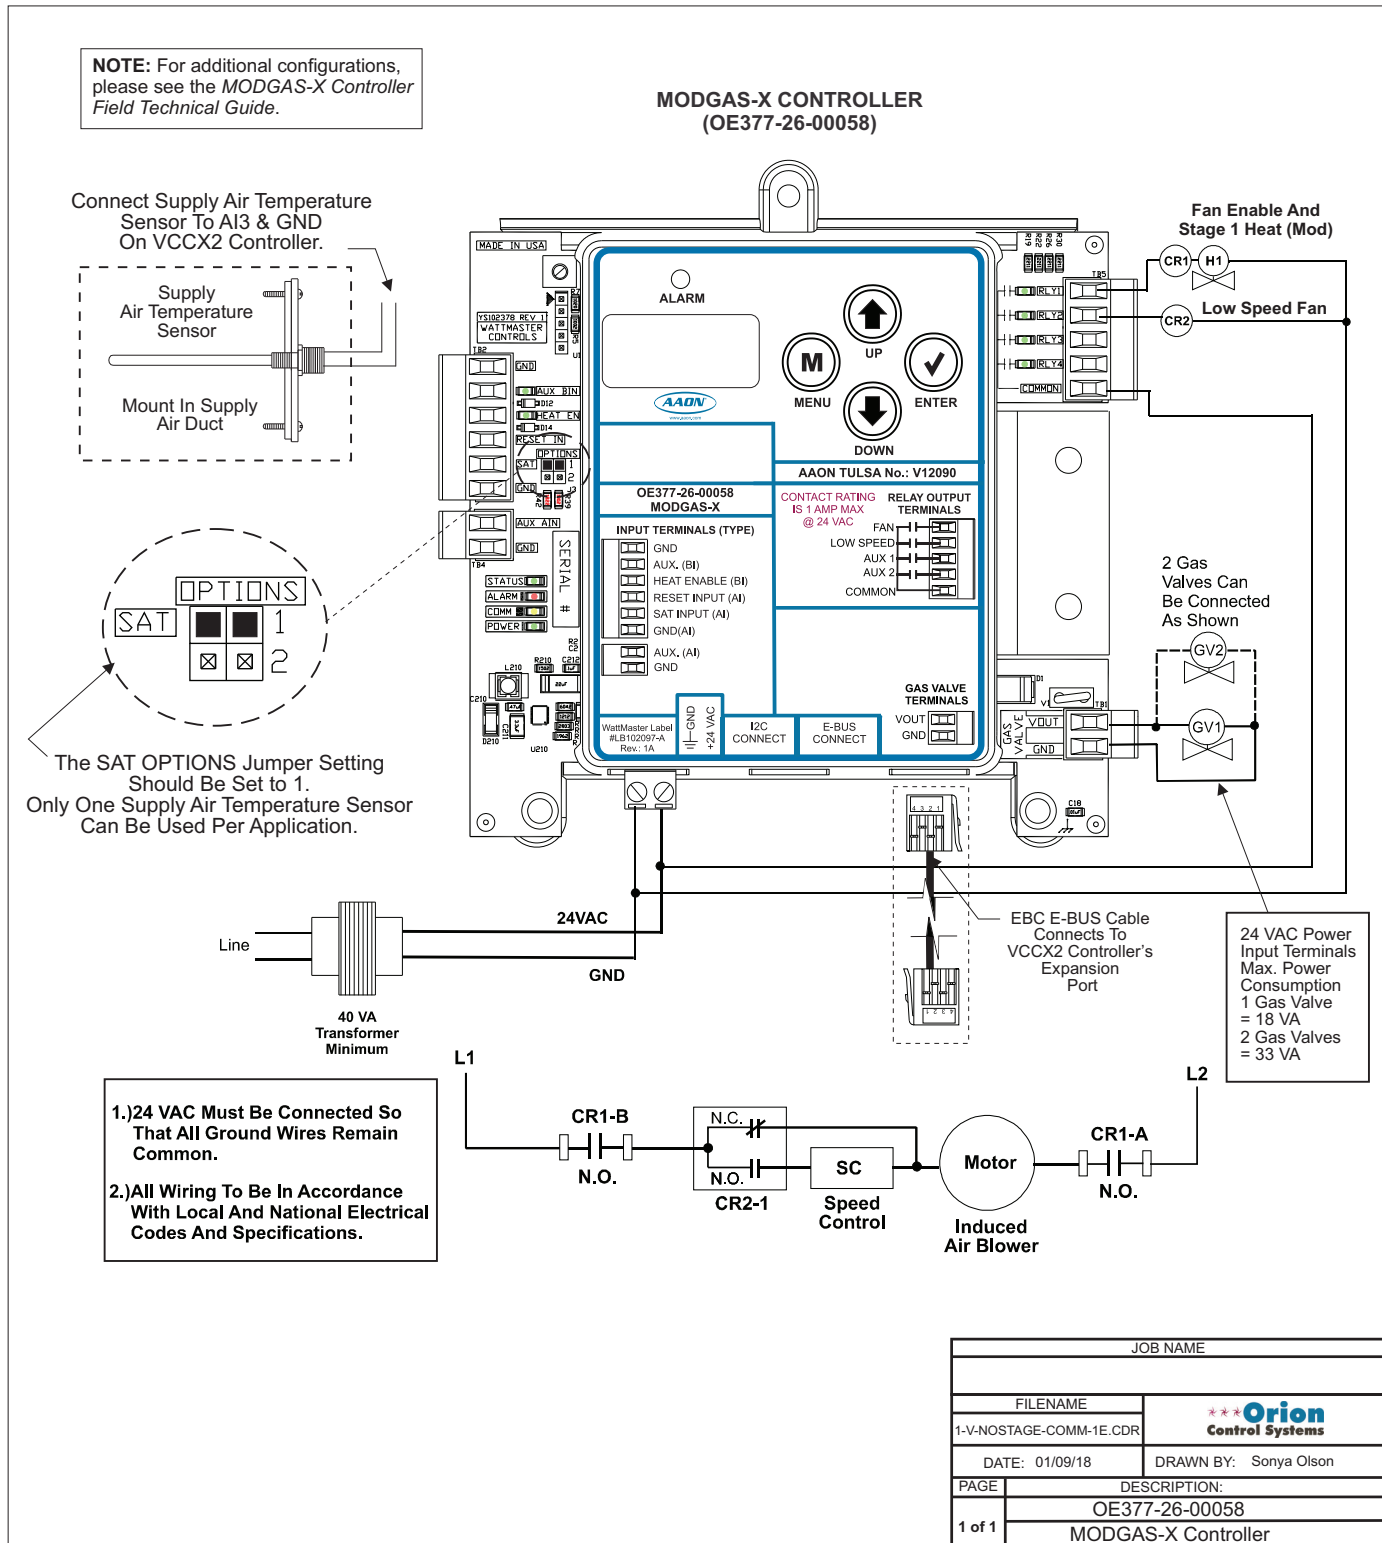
OE377-26-00058 - Single Modulating Valve No Staging Communicating
